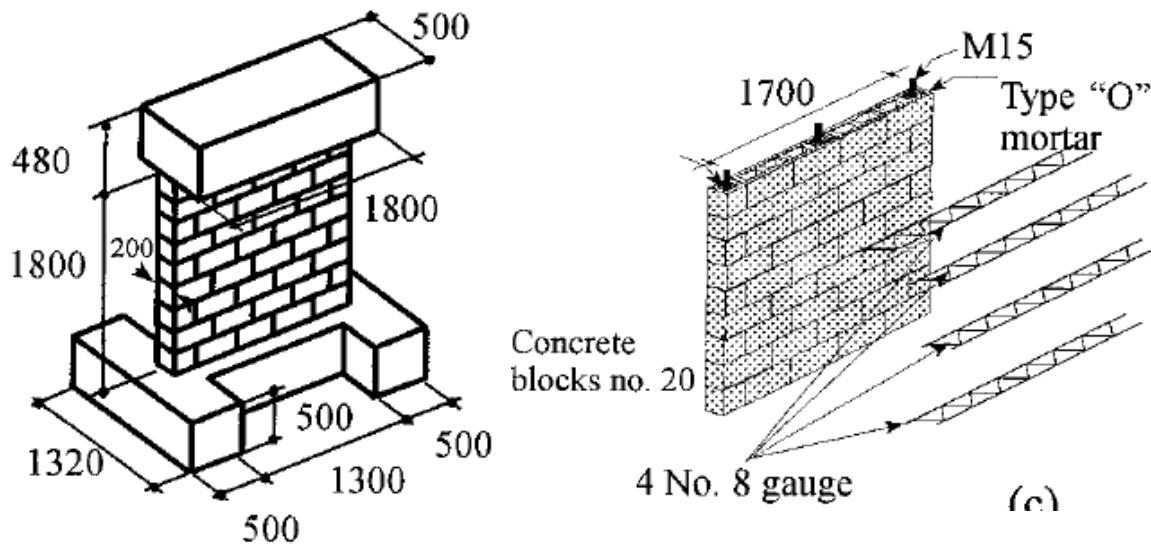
Reinforced masonry wall design details (Taghdi, et.al. 2000)
